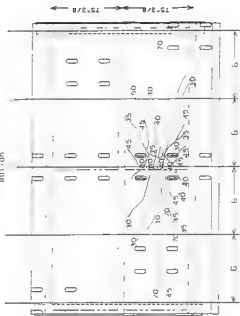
Bottom Cracking Pattern (Second Bridge - Test No 3)
